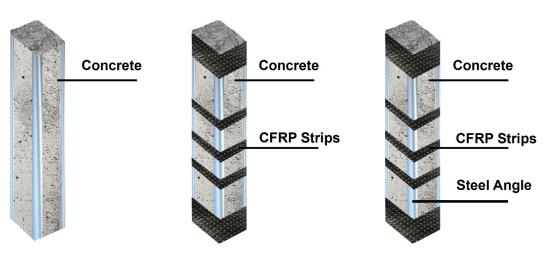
Stages of connecting CFRP strips to concrete for strength enhancement.
